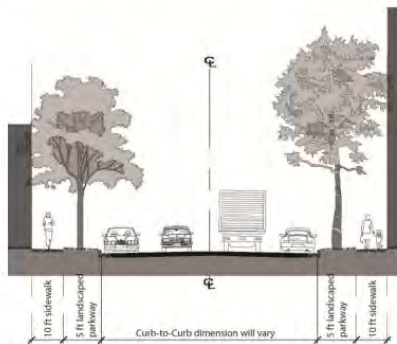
LANDSCAPE PARKWAY AND SIDEWALK REQUIREMENT
